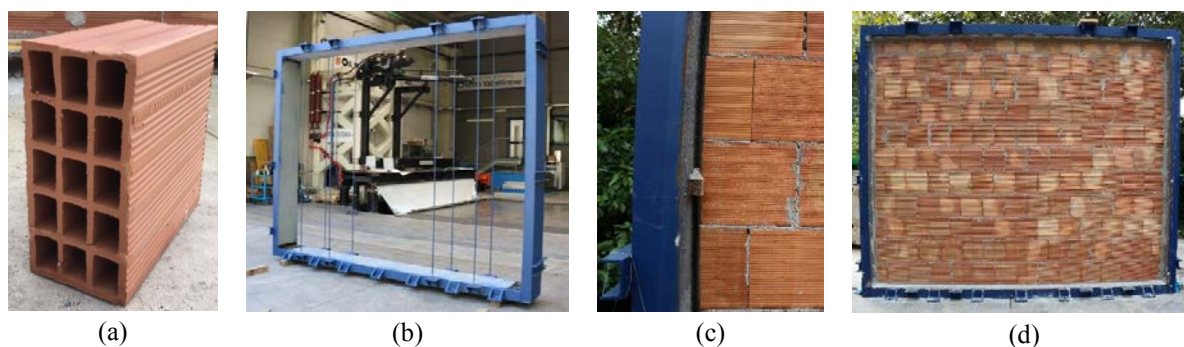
(1) Horizontally perforated clay units (b) Steel-concrete composite bare frame (c) Vertical gap in specimen T5 (d) Completed fully connected specimen
